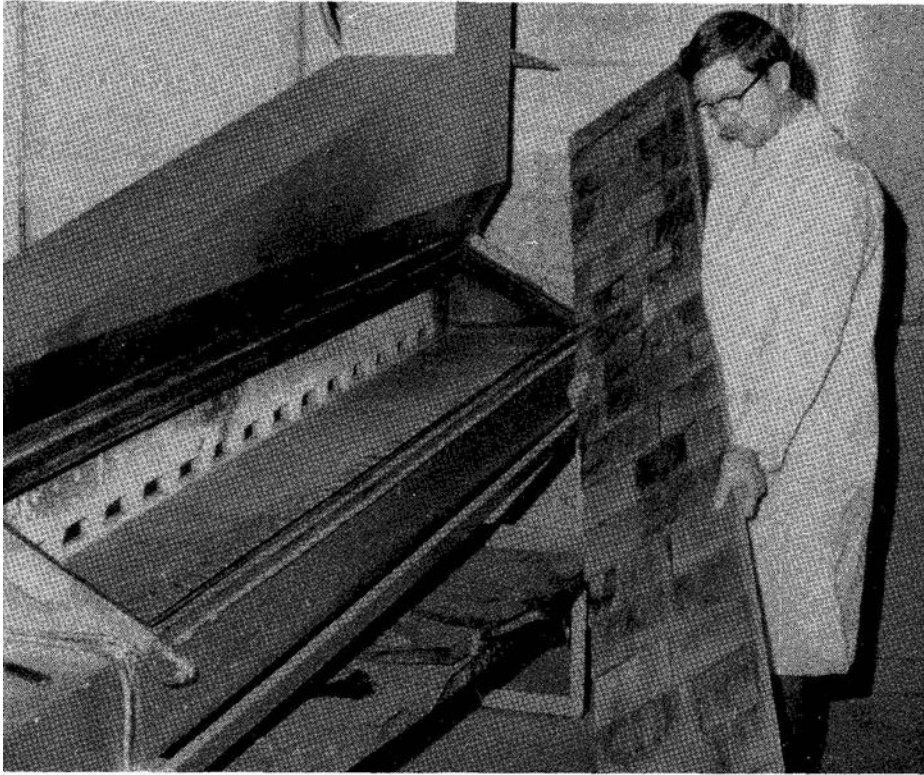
Shingle test specimen for 8-foot tunnel furnace.
